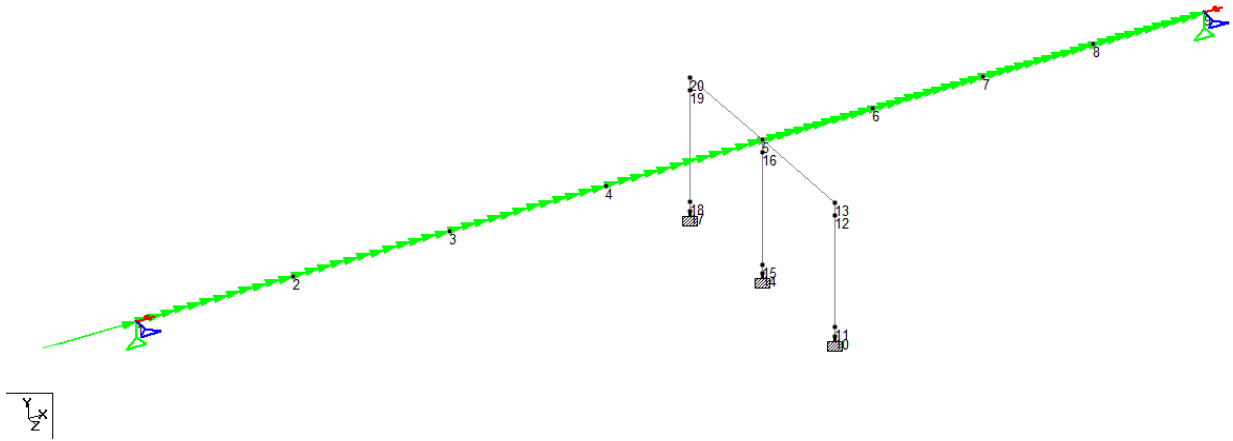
Bridge Model under Longitudinal Load of 100 kip/ft
